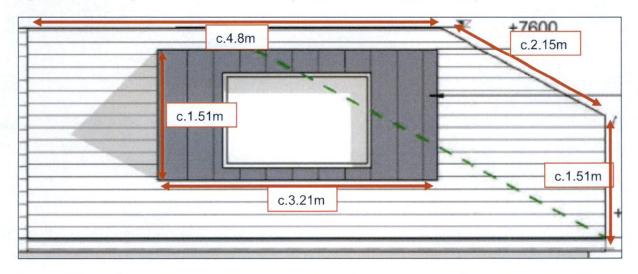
Revised front elevation showing dimensions approximately and larger hipped roof element.
